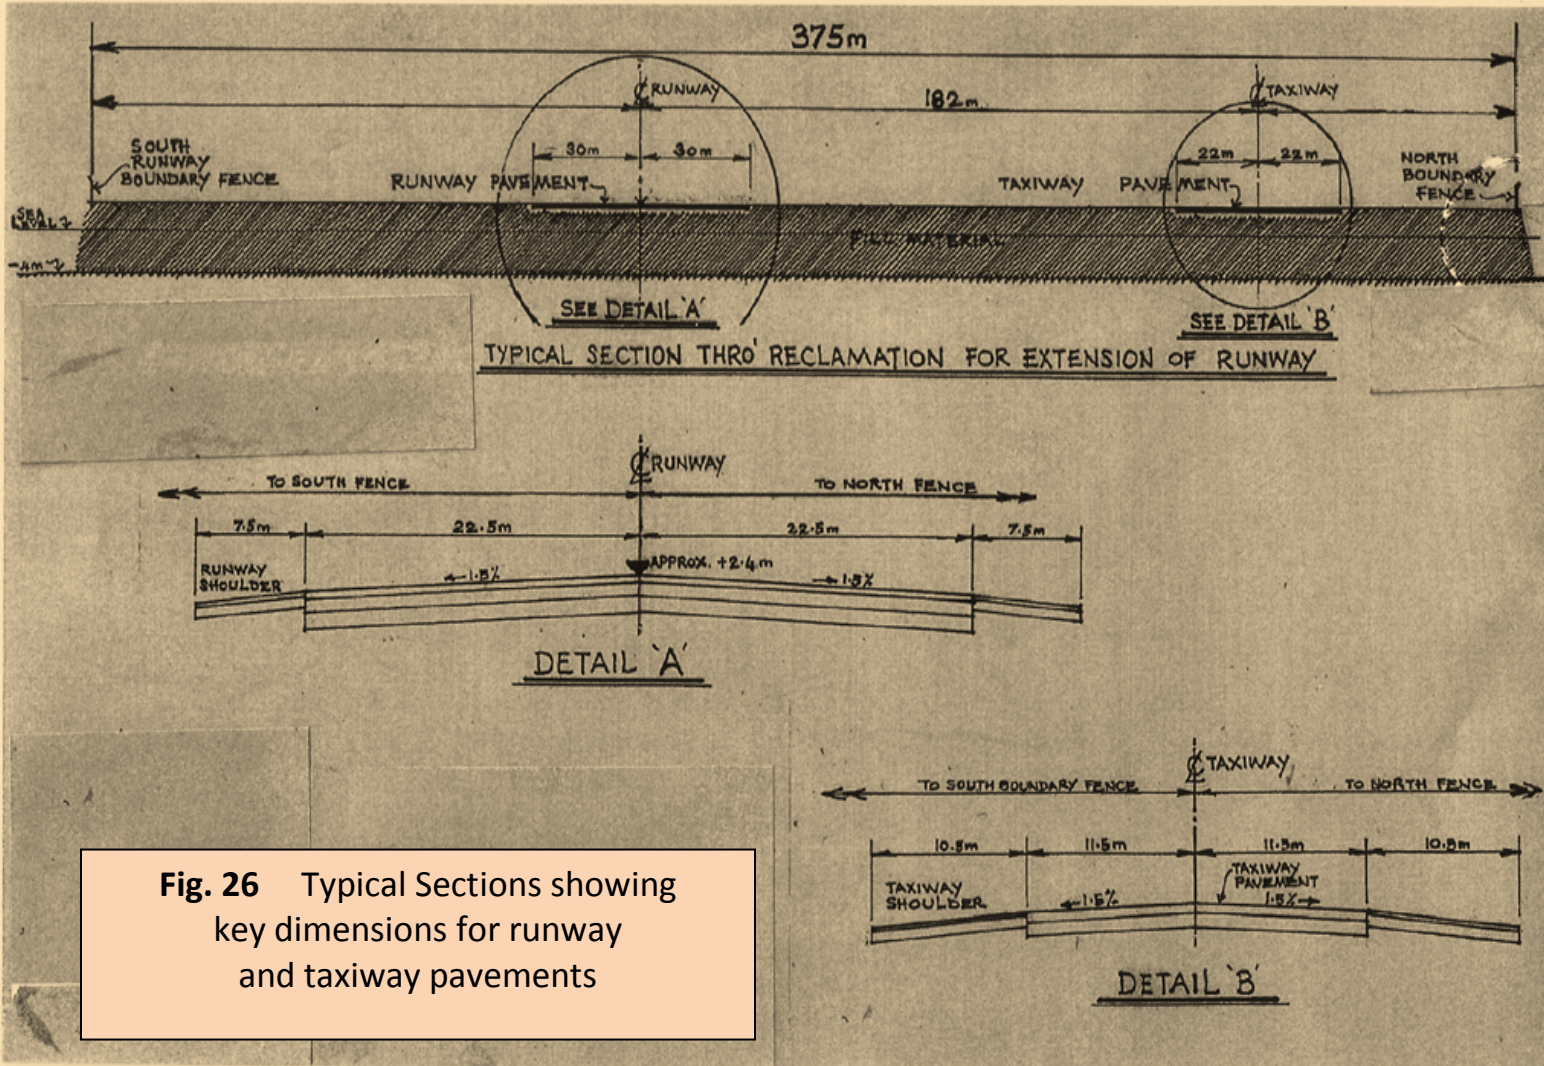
Typical Sections showing key dimensions for runway and taxiway pavements
